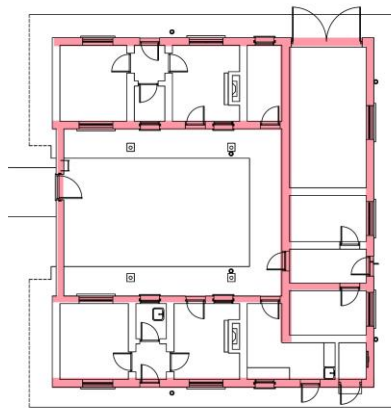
The plan shows the load bearing brick walls of the Bungalow. The load bearing brick walls are highlighted in red. Edited by Hannah Liu.
